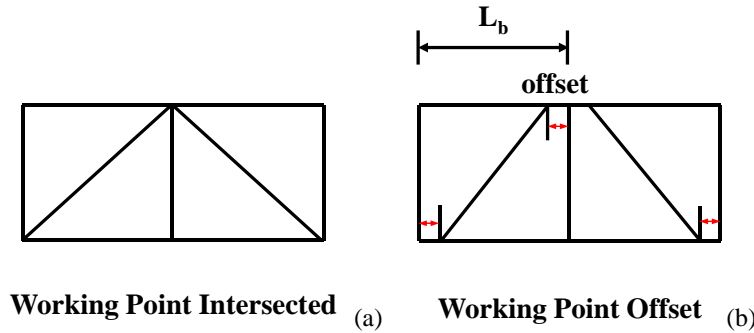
Tub girder panels with braces. (a) Working point does not have offset, and (b) Working point has offset
